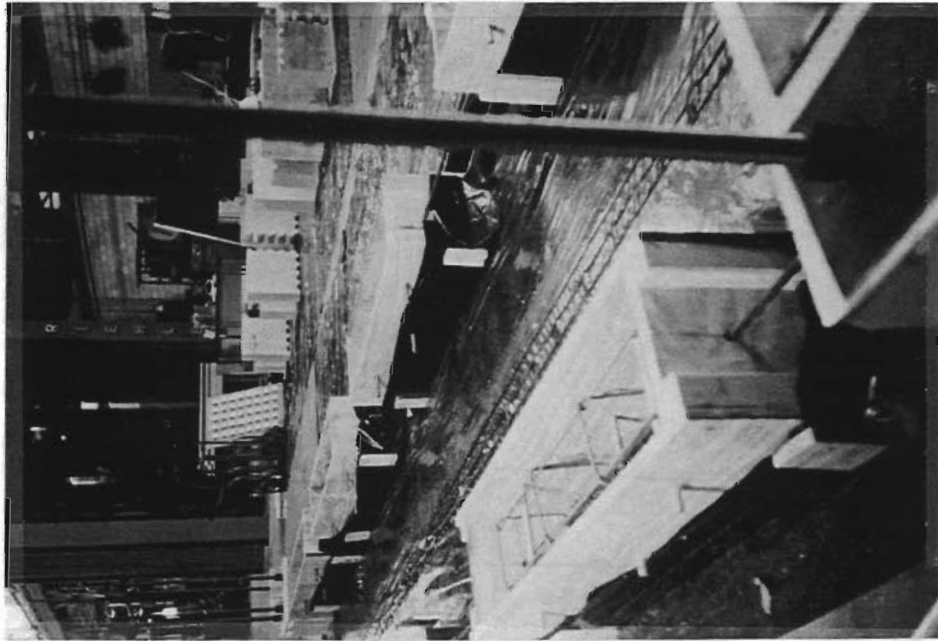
4 *Concrete blocks for providing end restraint - layout
